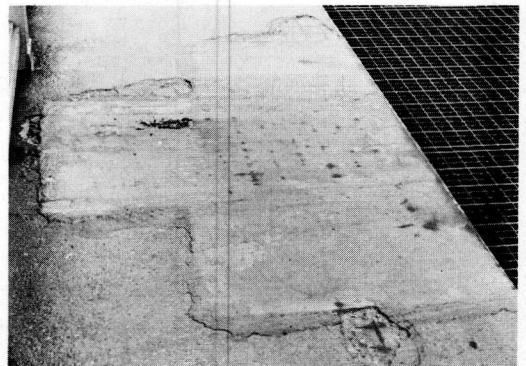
Further failure around large latex-mortar patch in north sidewalk.
